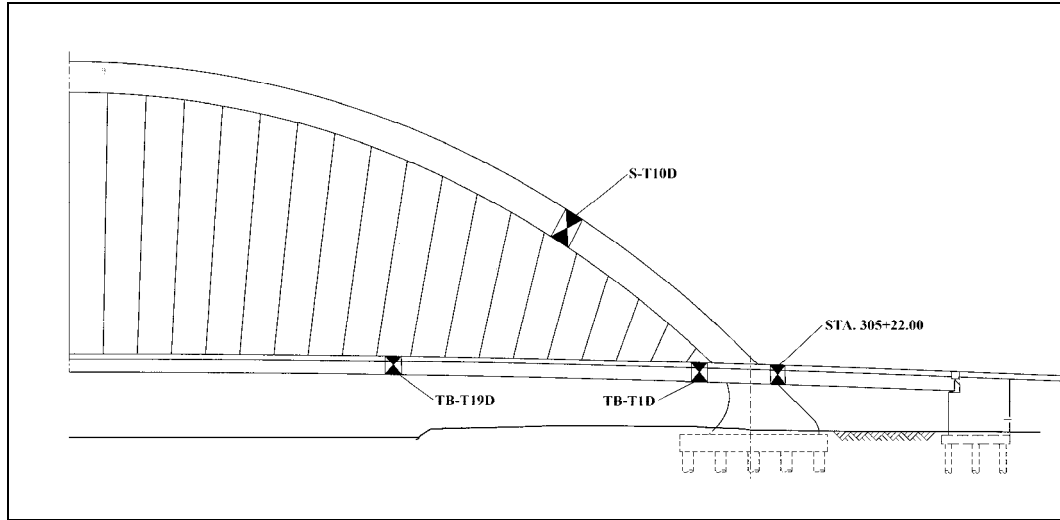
North Data Acquisition System Locations (Modified IRIB Specifications and Construction Plans)
